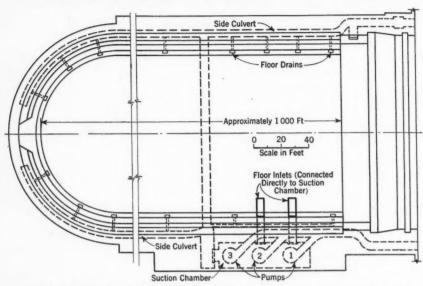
General Plan of Dry Dock Showing Culvert System and Suction Chamber]
